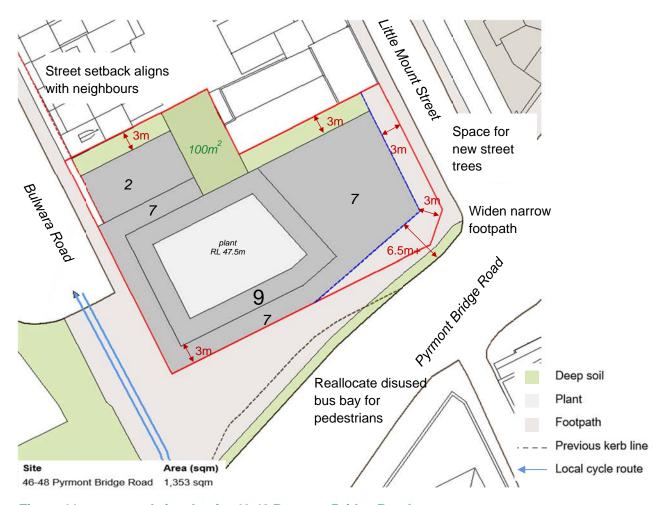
proposed site plan for 46-48 Pyrmont Bridge Road
